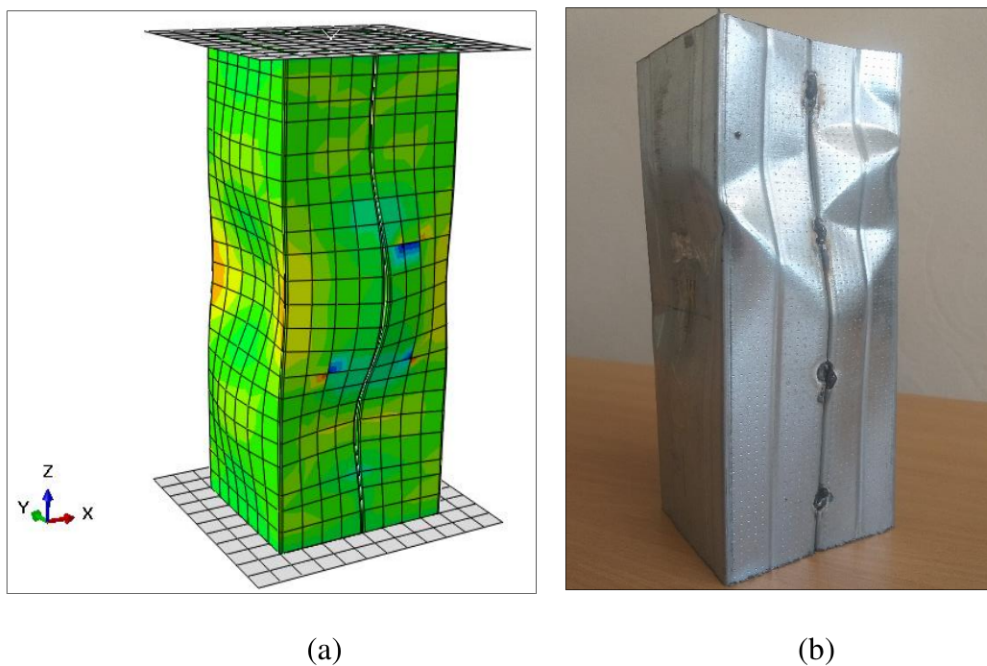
Failure mode of cold-formed steel built-up face-to-face unfilled column: (a) Numerical; (b) Experimental.
